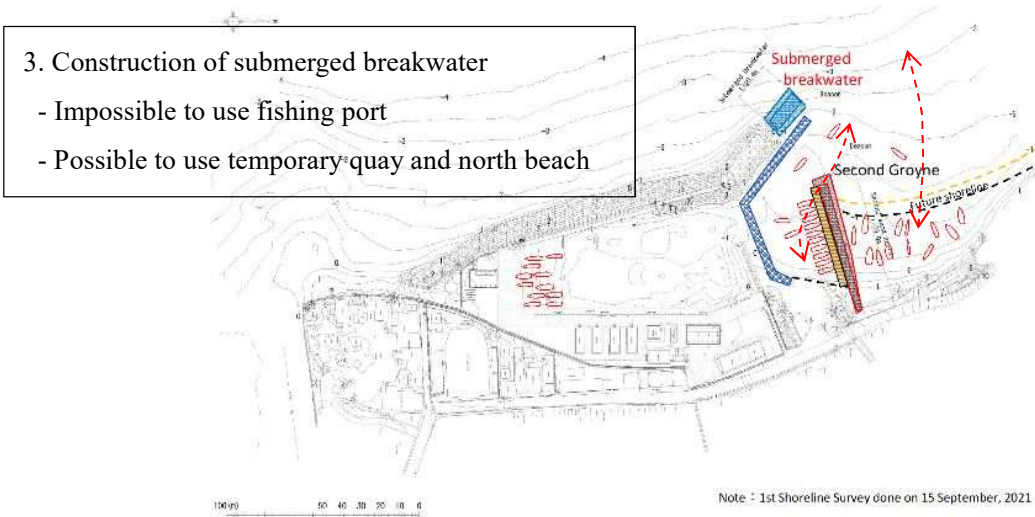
(3) Construction of submerged breakwater (construction phase and minor improvement work)
